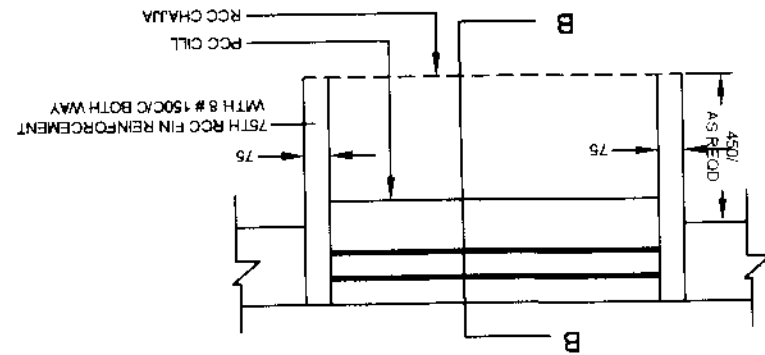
DETAILS OF RCC CHAJJA TYPE A & B ARE ALSO APPLICABLE FOR OUT SIDE DOORS/OPENINGS AS INDICATED IN MAIN DRAWINGS
